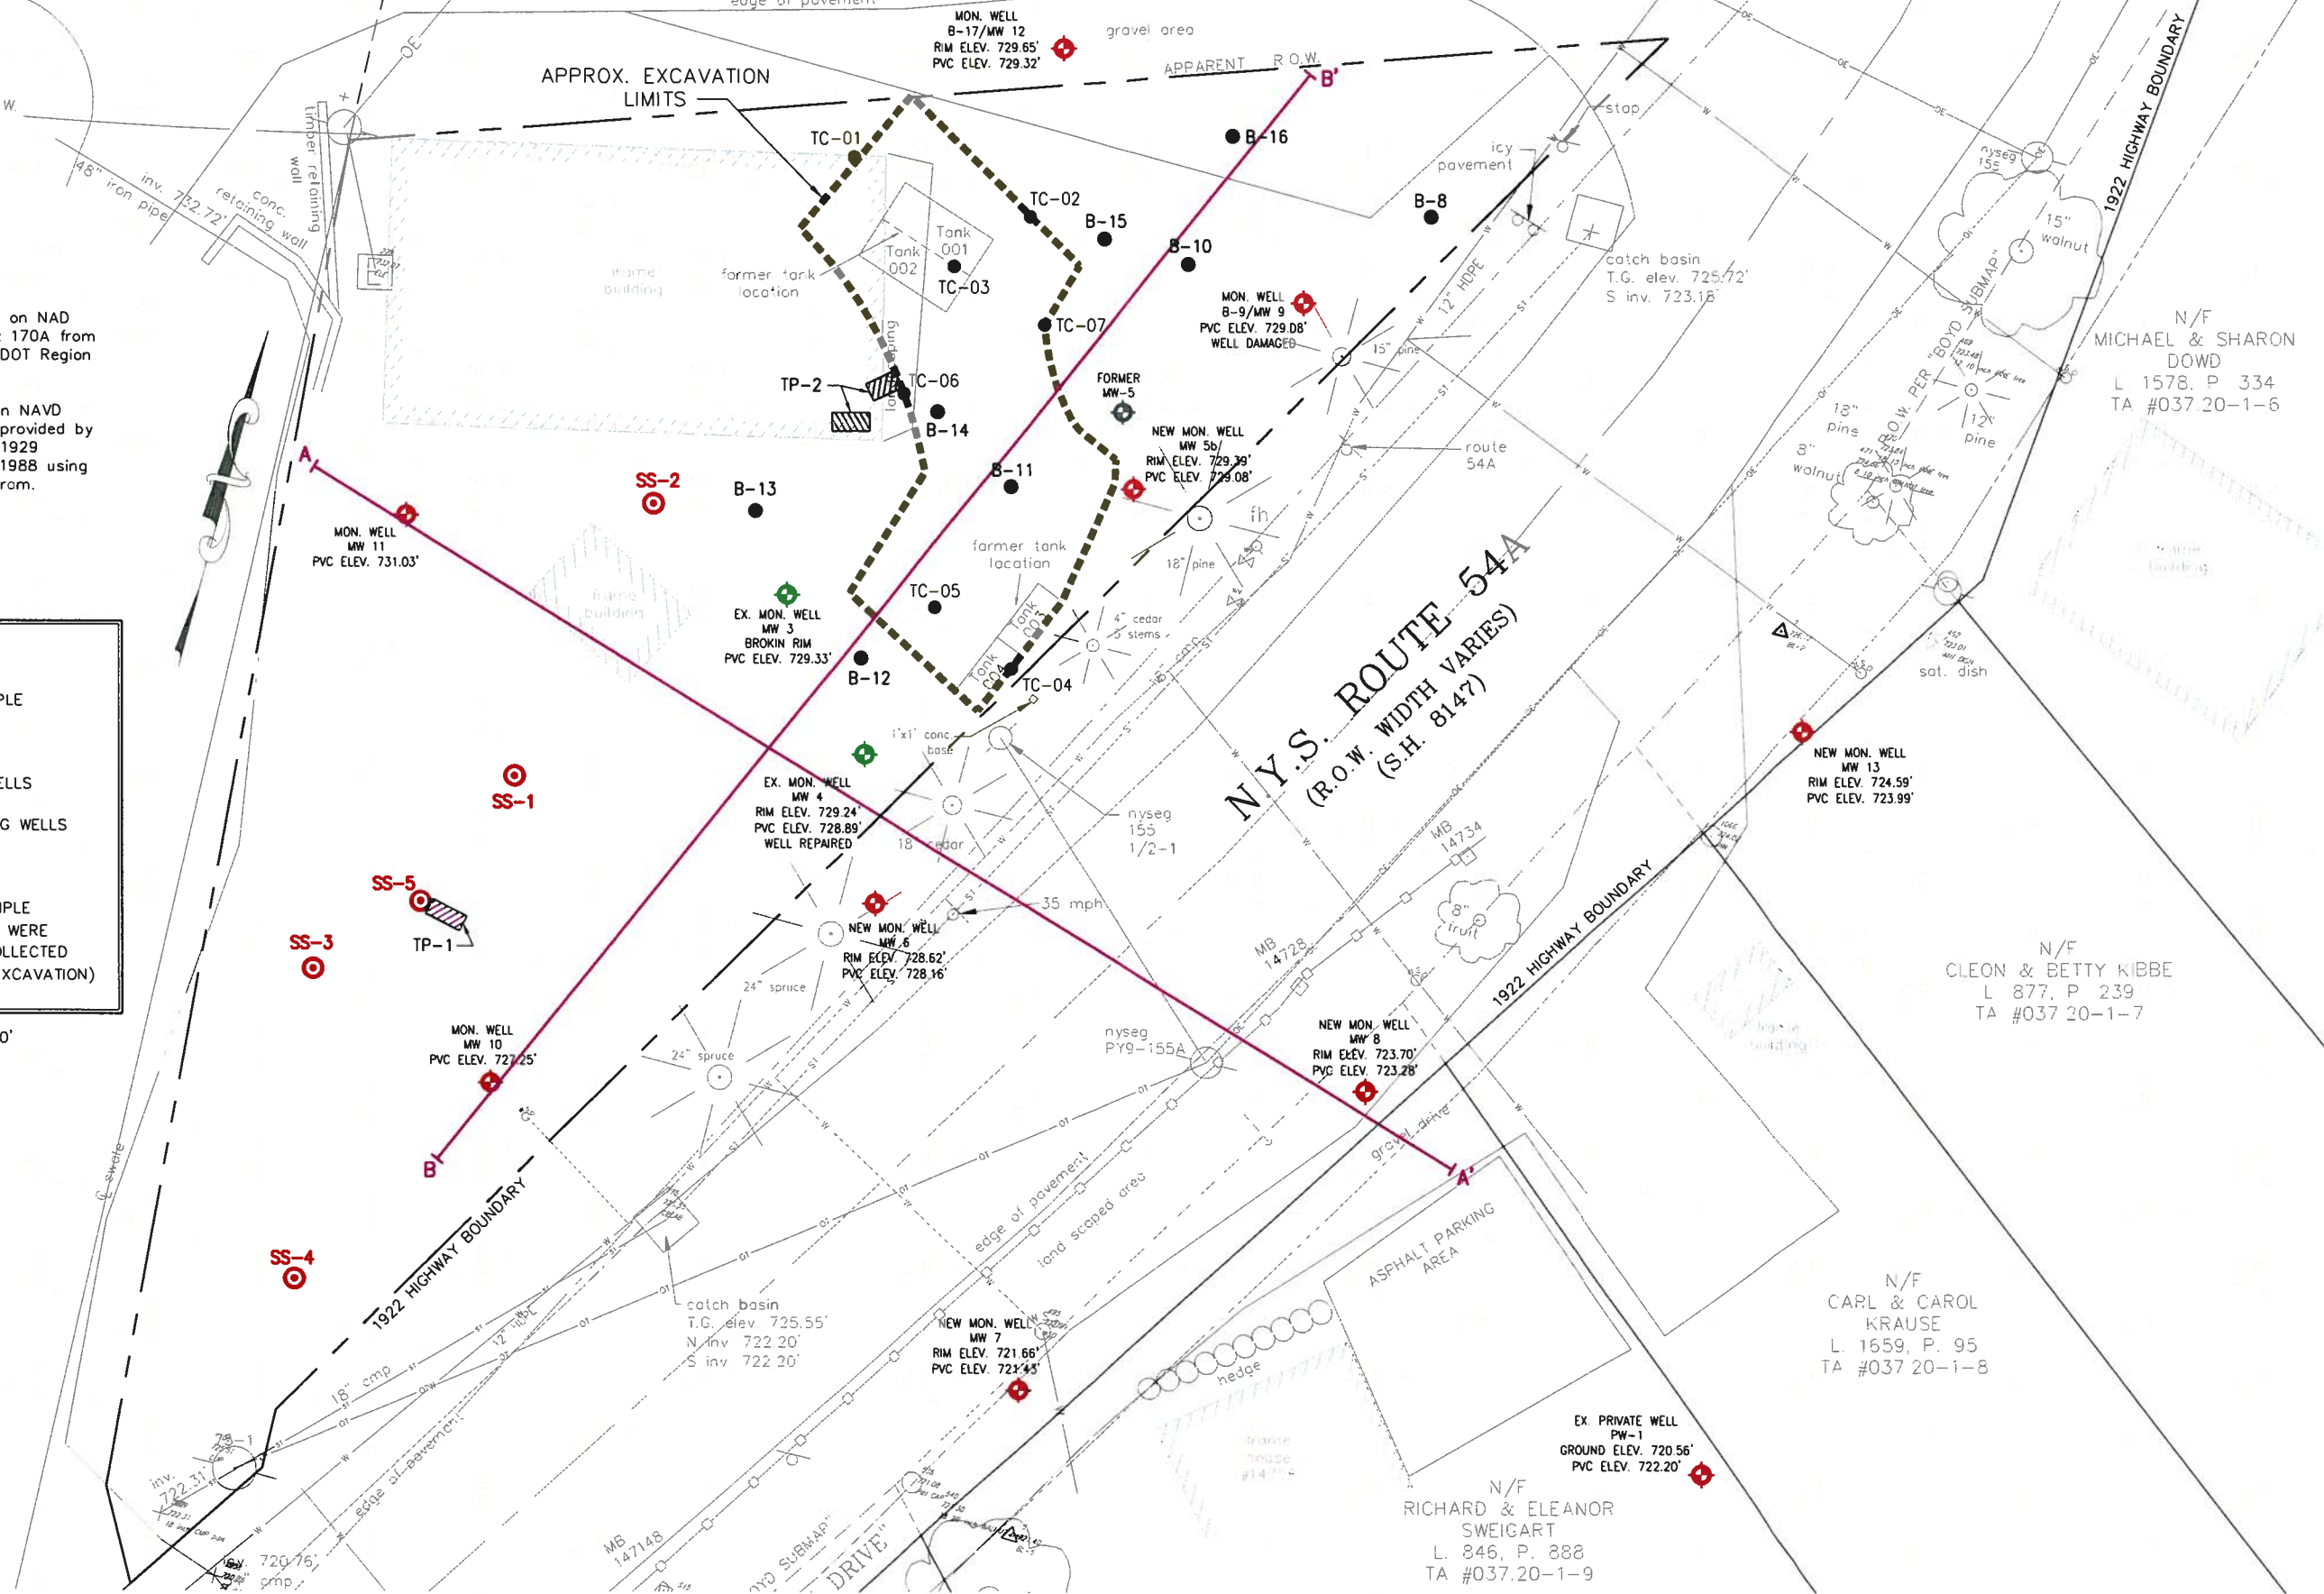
SOIL CROSS SECTION LOCATIONS
